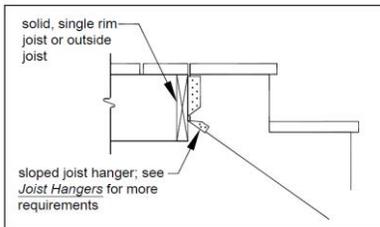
STAIR STRINGER ATTACHMENT DETAIL
